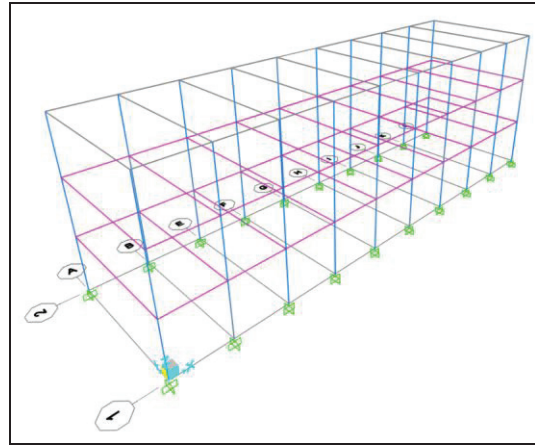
Numerical Model of the Typical RC-Framed School Building
